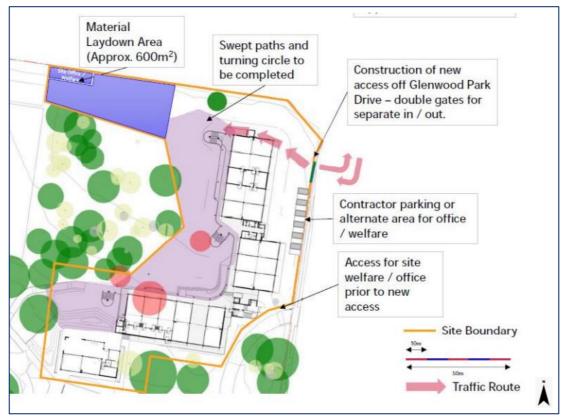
| Preliminary construction site layout (Source: Applicant's EIS, 2021)
